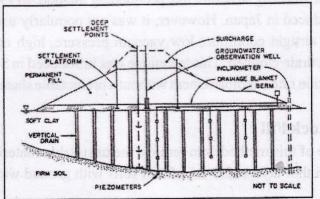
Typical Vertical Drain Installation for a Highway Embankment (Rixner et al, 1986)
